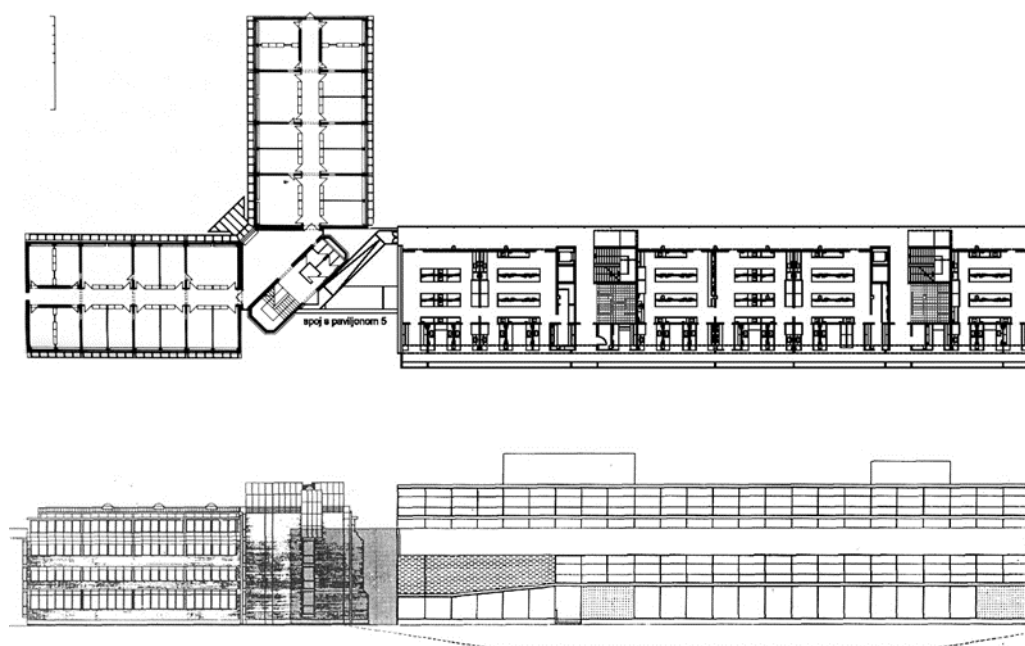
Plan of the second floor and eastern facade, Pavilion V (B. Radimir, H. Auf-Franić, L. Pleština) and Pavilion VI (H. Auf-Franić, V. Oluić)
